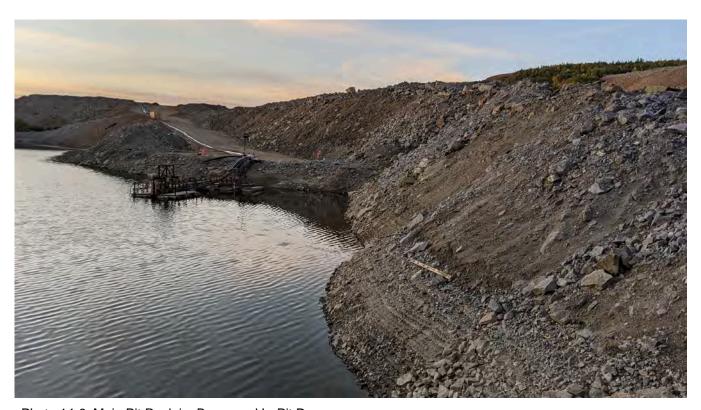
Main Pit Reclaim Barge and In-Pit Dumps.
